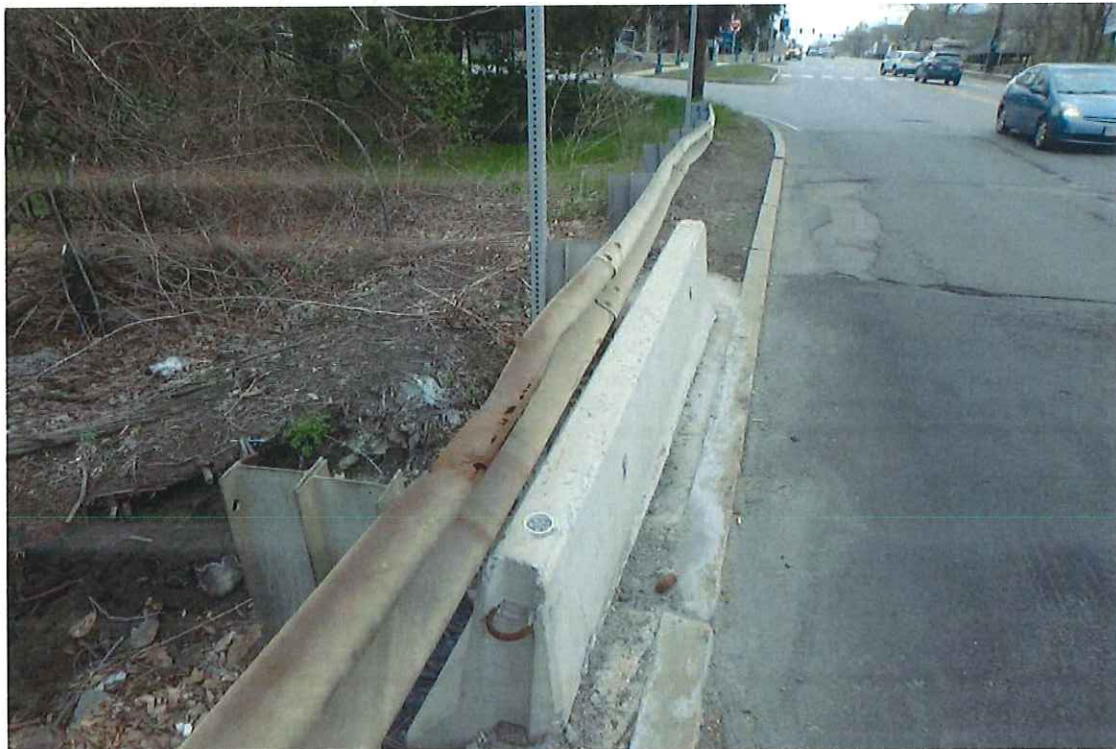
Northeast approach guardrail: 100% section loss and new barrier due to washout behind rail.
